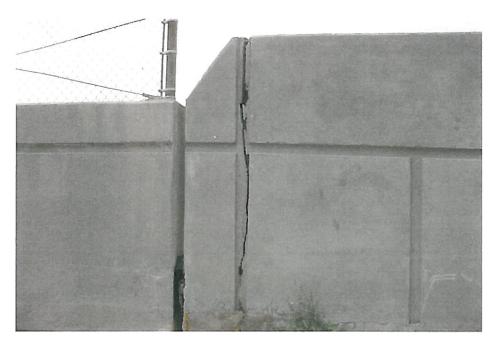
South Marginal Road bridge structure (Memorial Shoreway) – Northeast abutment
